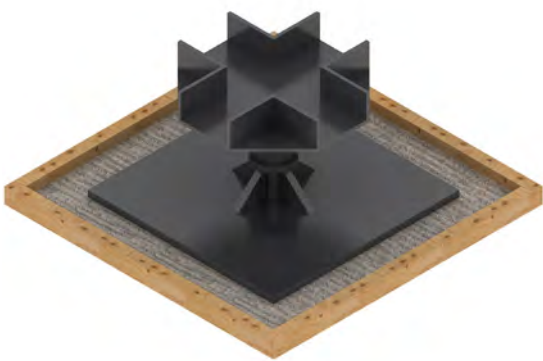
Adjustable Footing in Versailles Site
